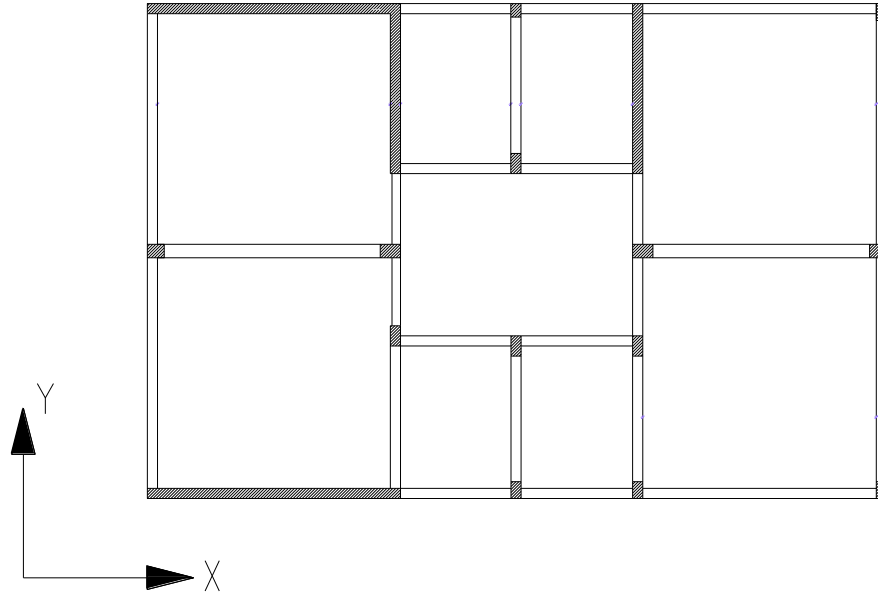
Plan View of G.O.P. Ülkü Primary School Block B
